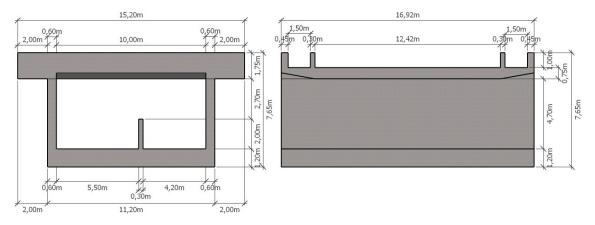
Structural dimensions rail crossing section (SketchUp).
